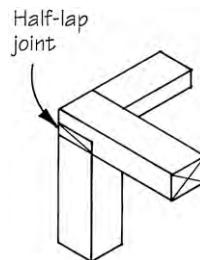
When joining handrails above 4x4 posts, the author avoids mitered corners, which inevitably open with time. He prefers a half-lap joint, which looks neater and will remain tight.
